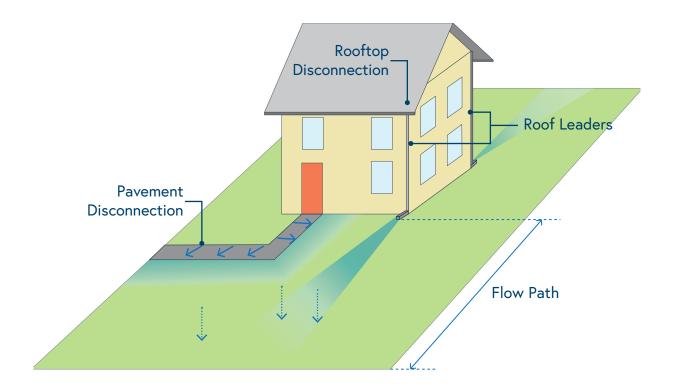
Disconnection Non-Structural BMPs Example
